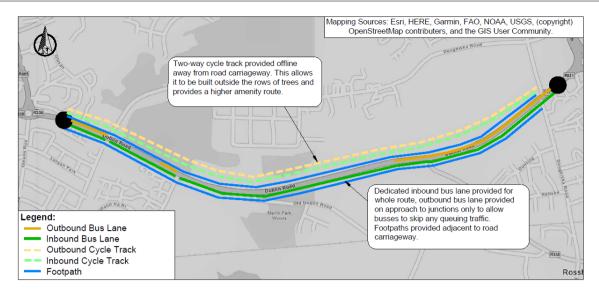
Section 2 Option 8 Indicative Scheme Design
